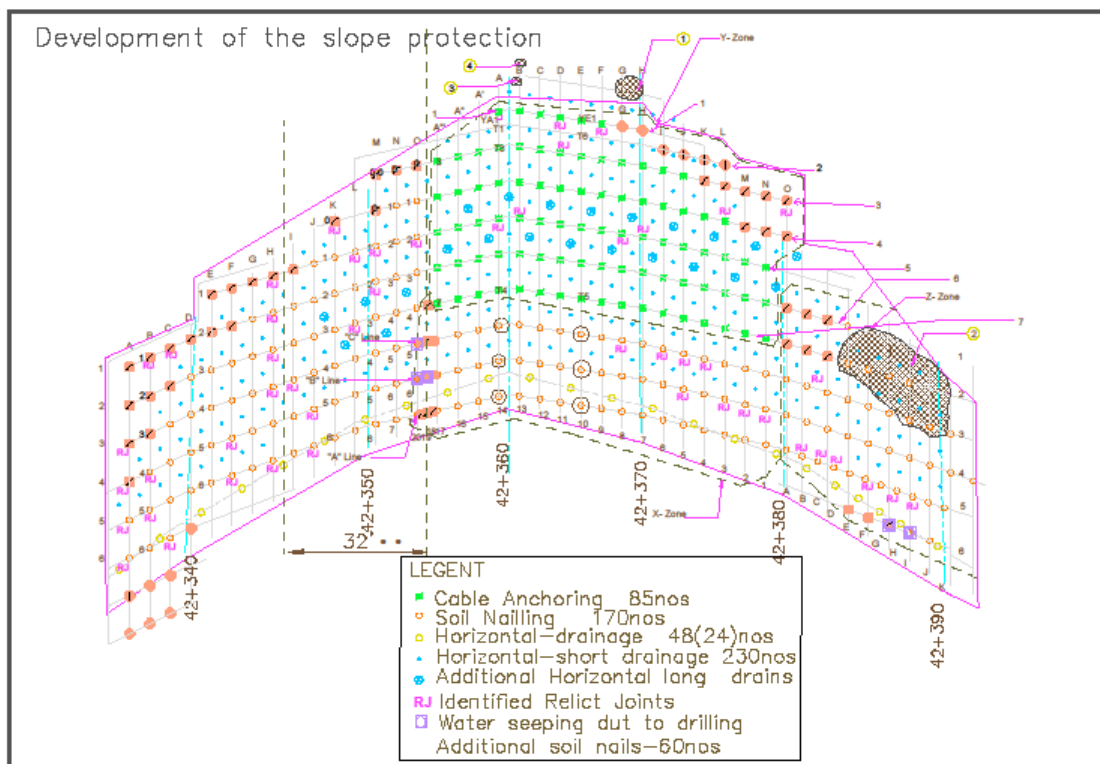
The location of soil nails, cable anchors and long horizontal drains
